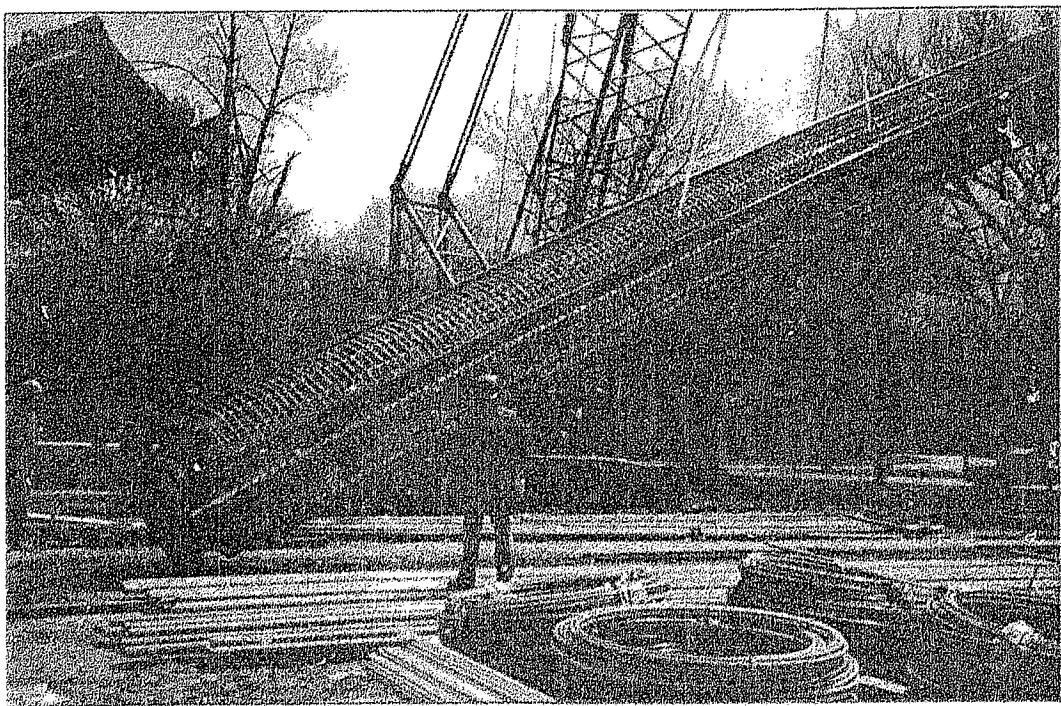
Osterberg Cell and Reinforcing Steel Cage Being Lifted Prior to Installation
